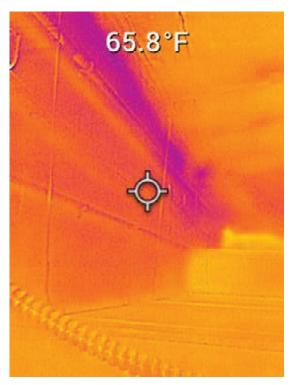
&7 – Interior ceiling plenum at exterior wall. Gyp sealed to CMU wall. Some penetrations. Cold spot at the top of the wall, but not enough to condense.
